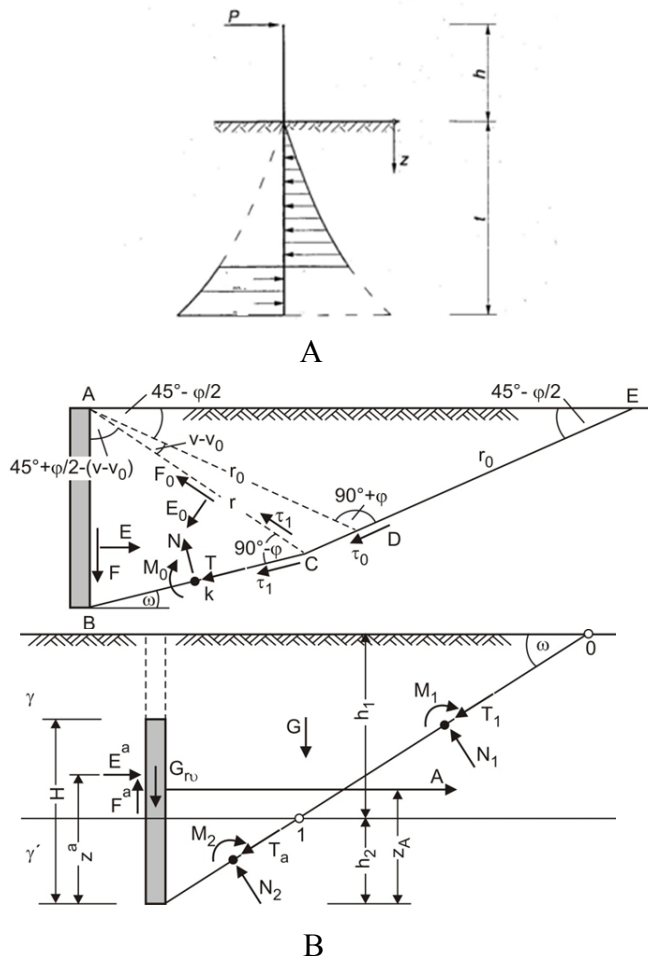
(A) Earth pressure distribution (B) Passive earth pressure on anchor plate [17]
